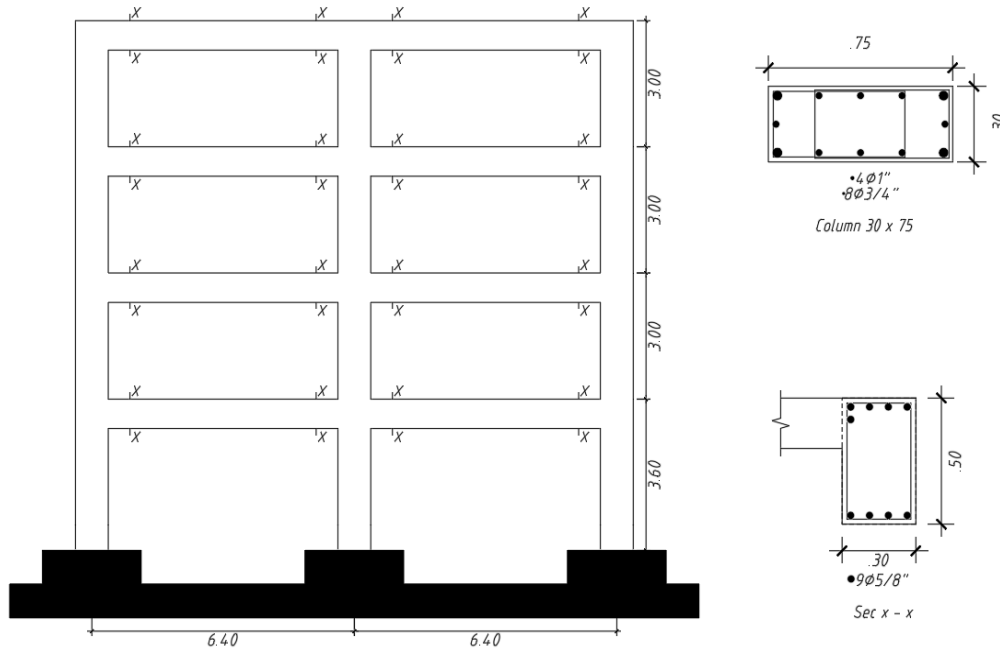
Reinforcement Configuration adopted in the reinforced concrete frame
